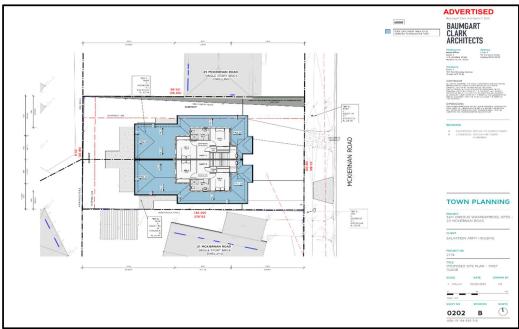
First Floor Plan of the proposed development. Source: Application submission.
